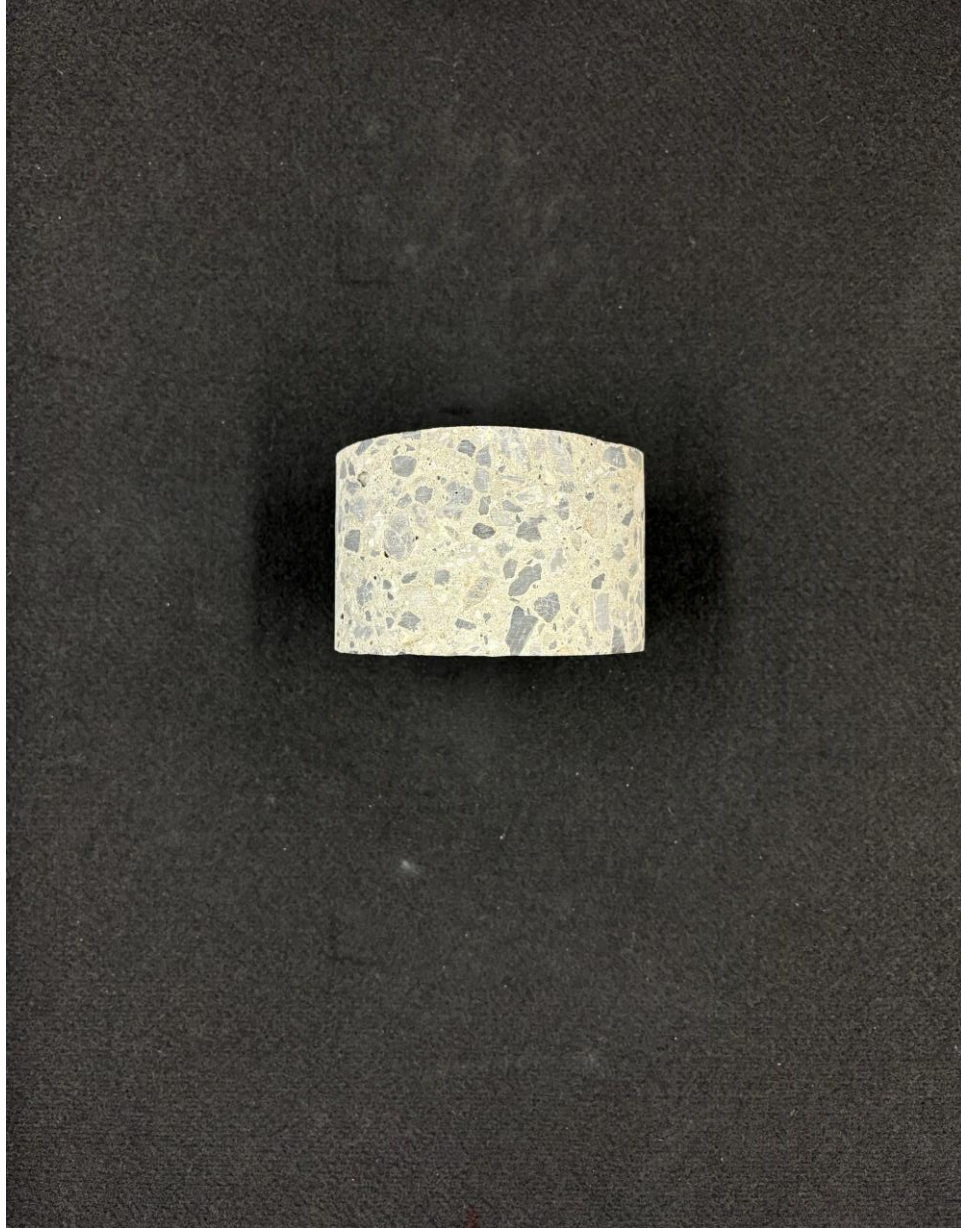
Core 5 of lightweight concrete deck at bridge F-792.
